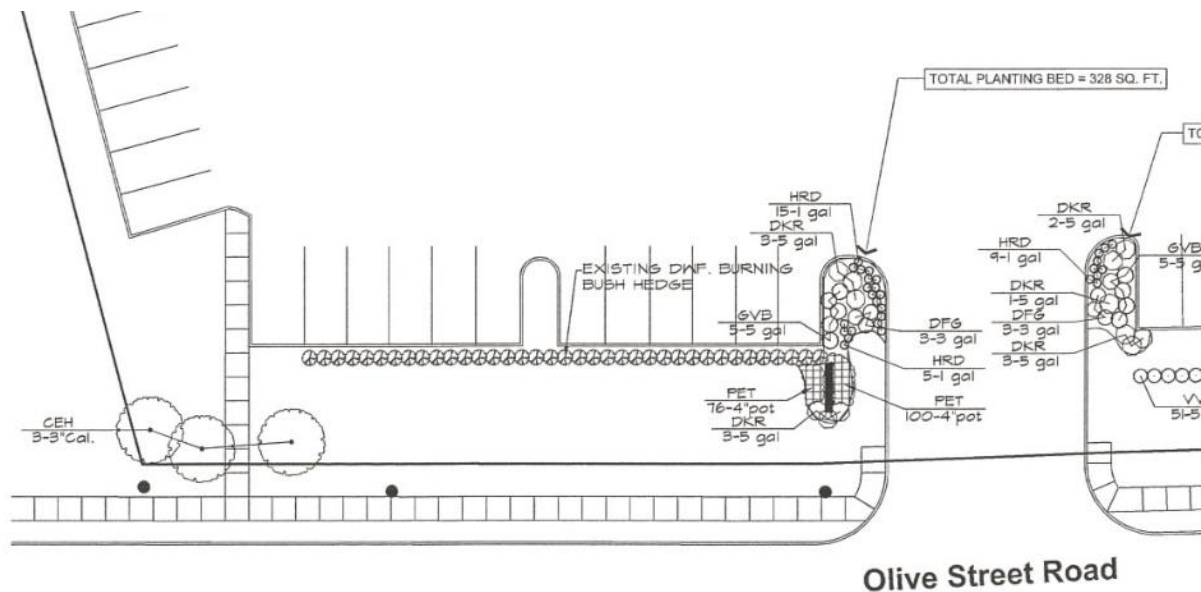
Close-up of the landscaping approved along Olive Boulevard in August to replace the missing trees and plantings for compliance with the last approved plan.
